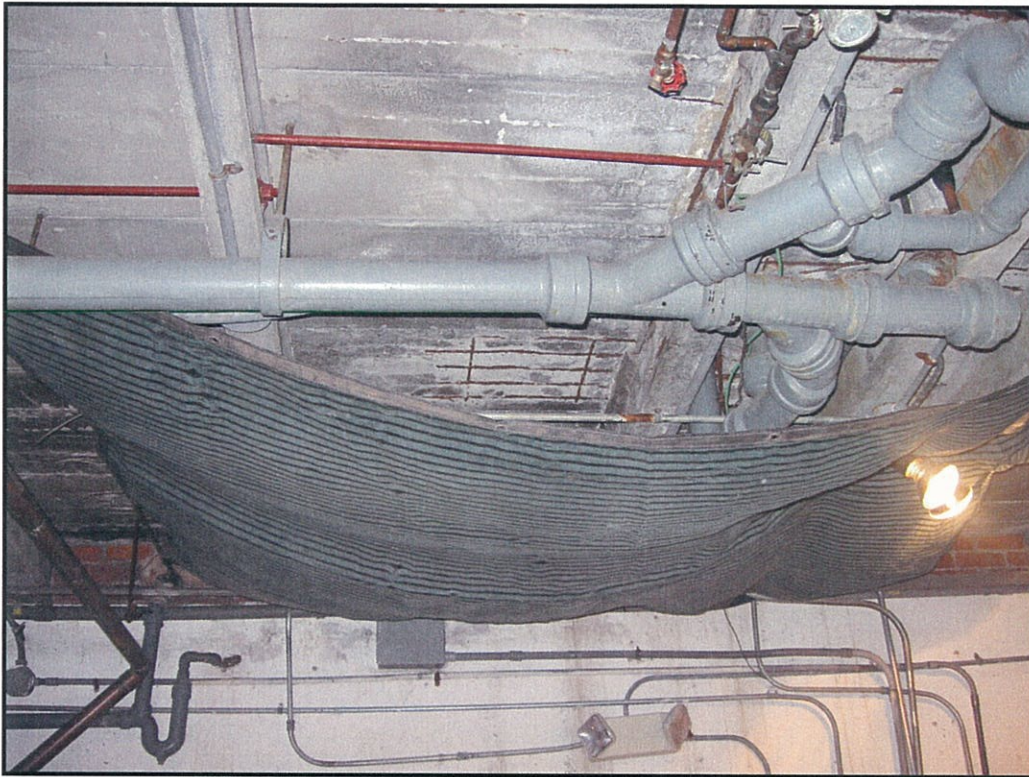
Concrete Spalled From Underside of Bathhouse Floor
